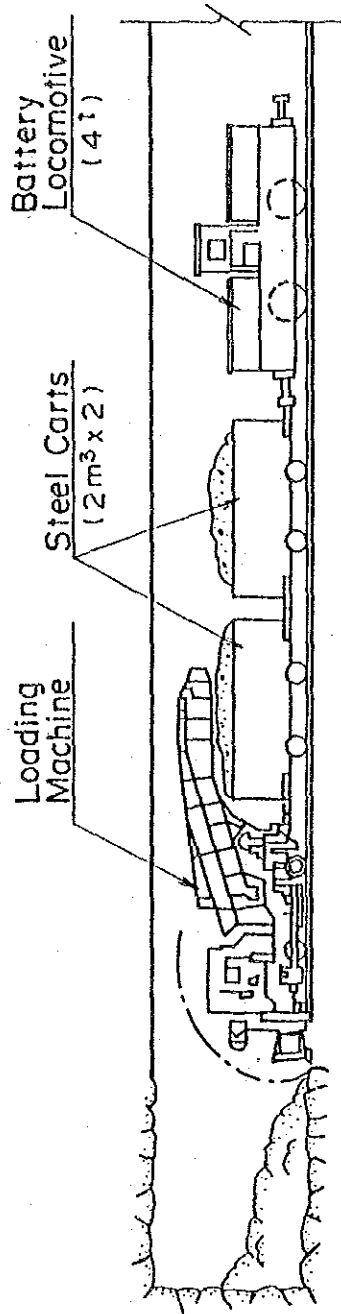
Loading Machine of Tunnel Excavation
